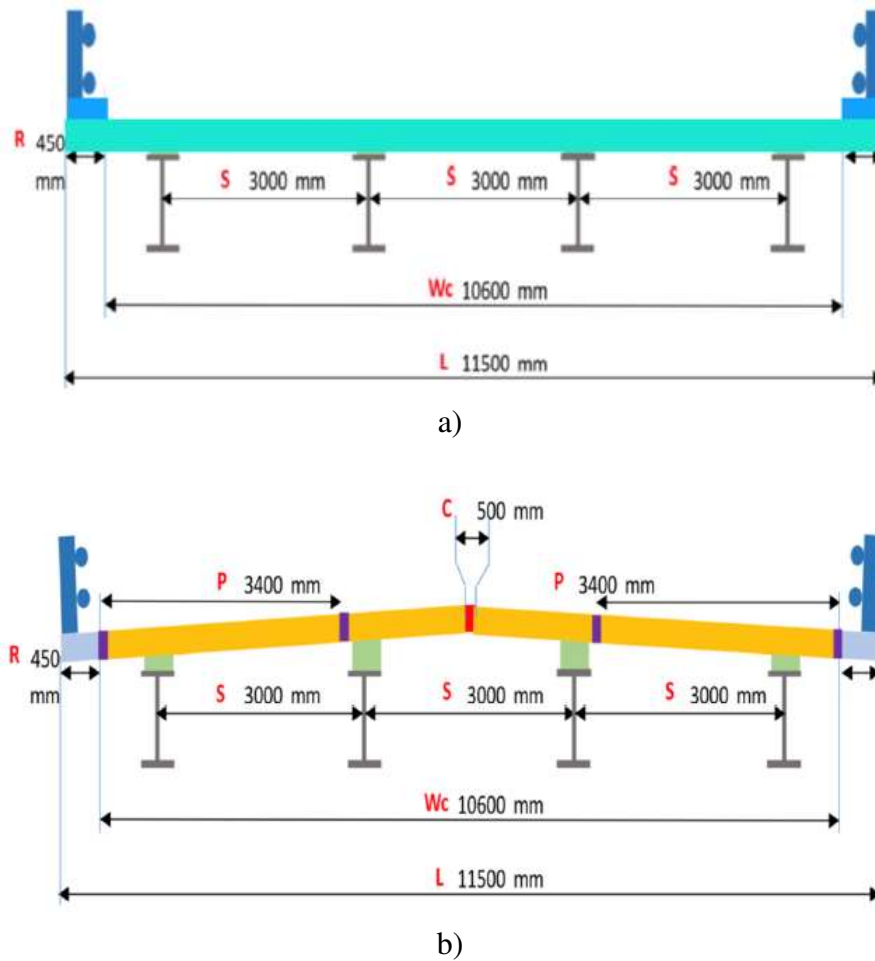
Section details and main dimensions of bridge deck design: a) concrete-steel composite bridge and b) aluminum-steel composite bridge
